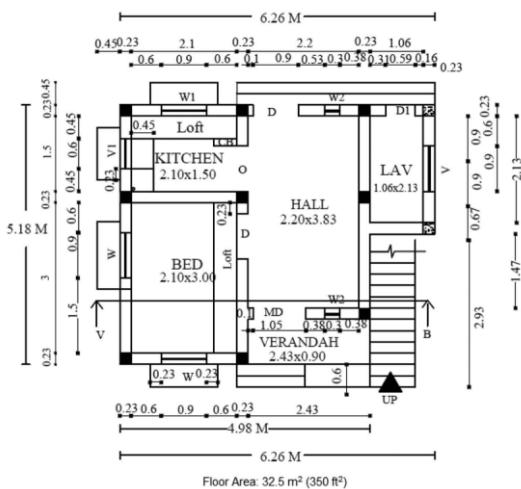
Floor plan of a typical EWS type dwelling unit (Devi and Palaniappan, 2018)
